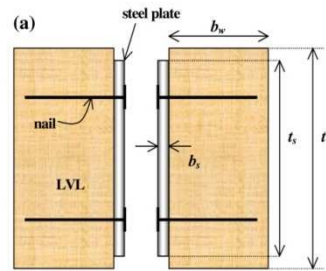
Schematic cross-section of a beam pair showing the arrangement of steel plates and nailing direction (117)
